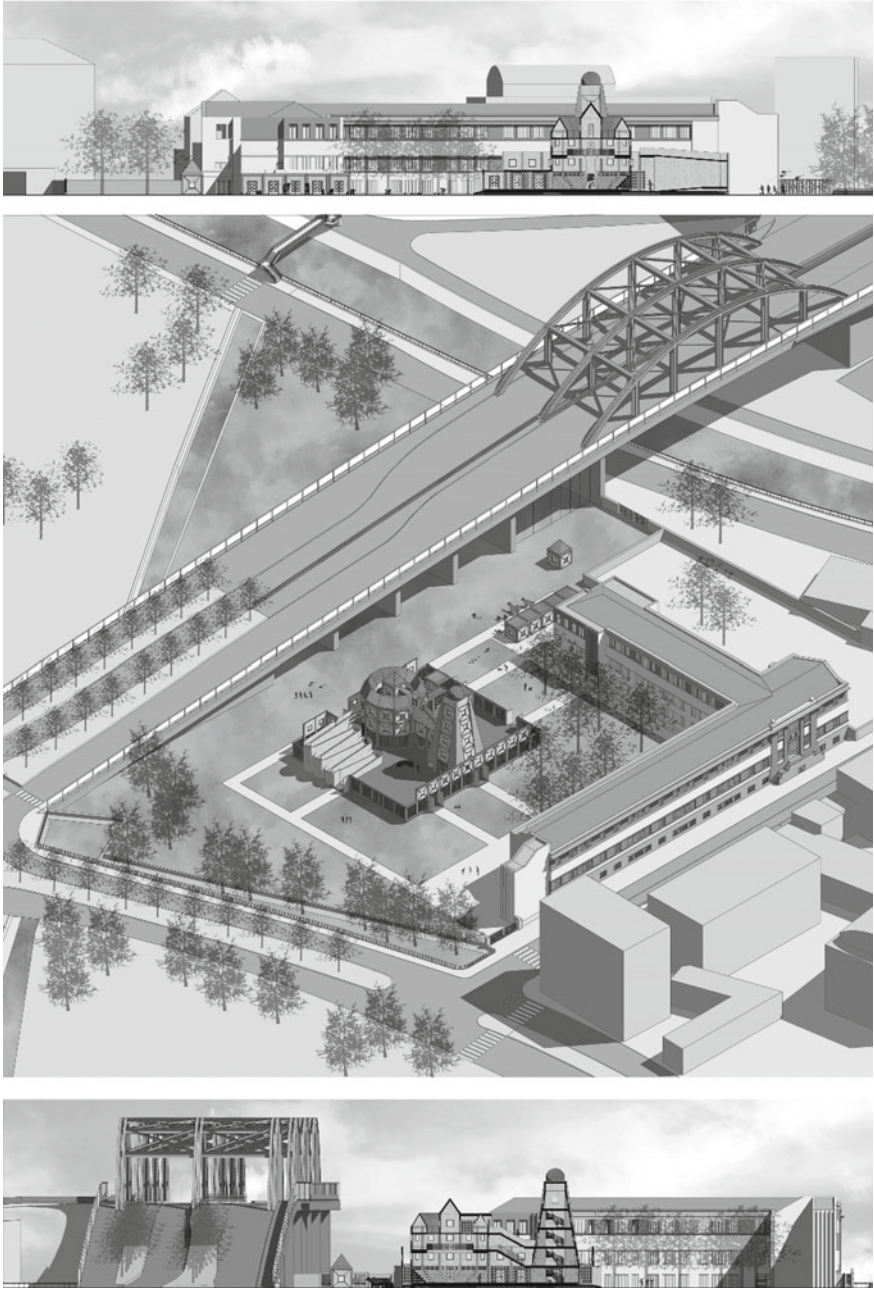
The pavilion “Carro di Tespi”. Longitudinal section, General view, Cross section
